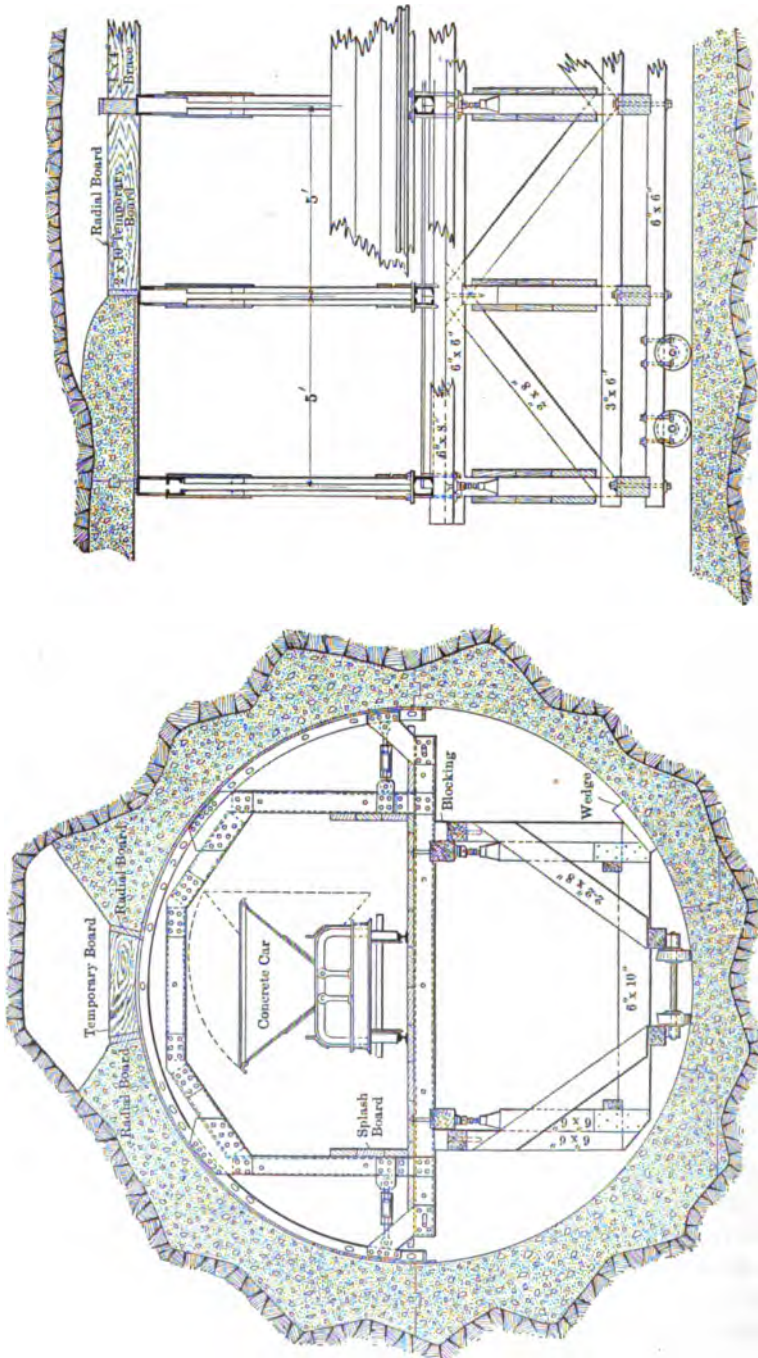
Contract 47. Construction of Steel Blow Forms and Wooden Carriage, as Used for Concreting Arch of Wallkill Tunnel. Forms were 60 feet long and were concreted in about 16 hours.
